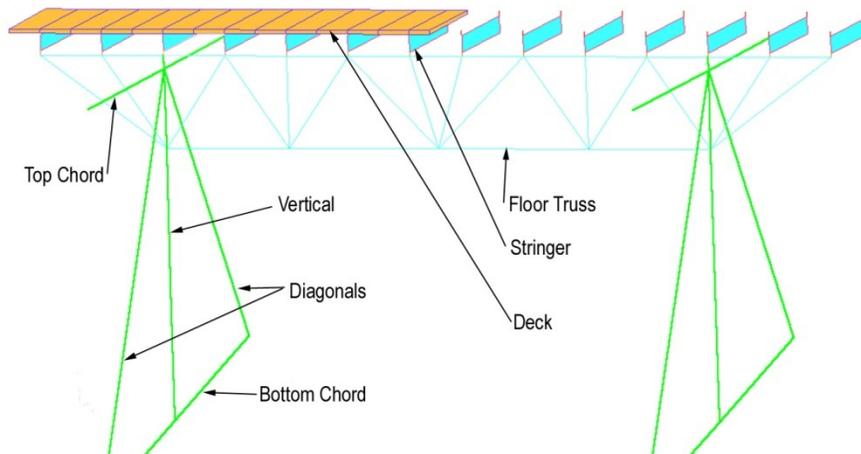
Partial Floor Truss and Stringer System with Southbound Deck
